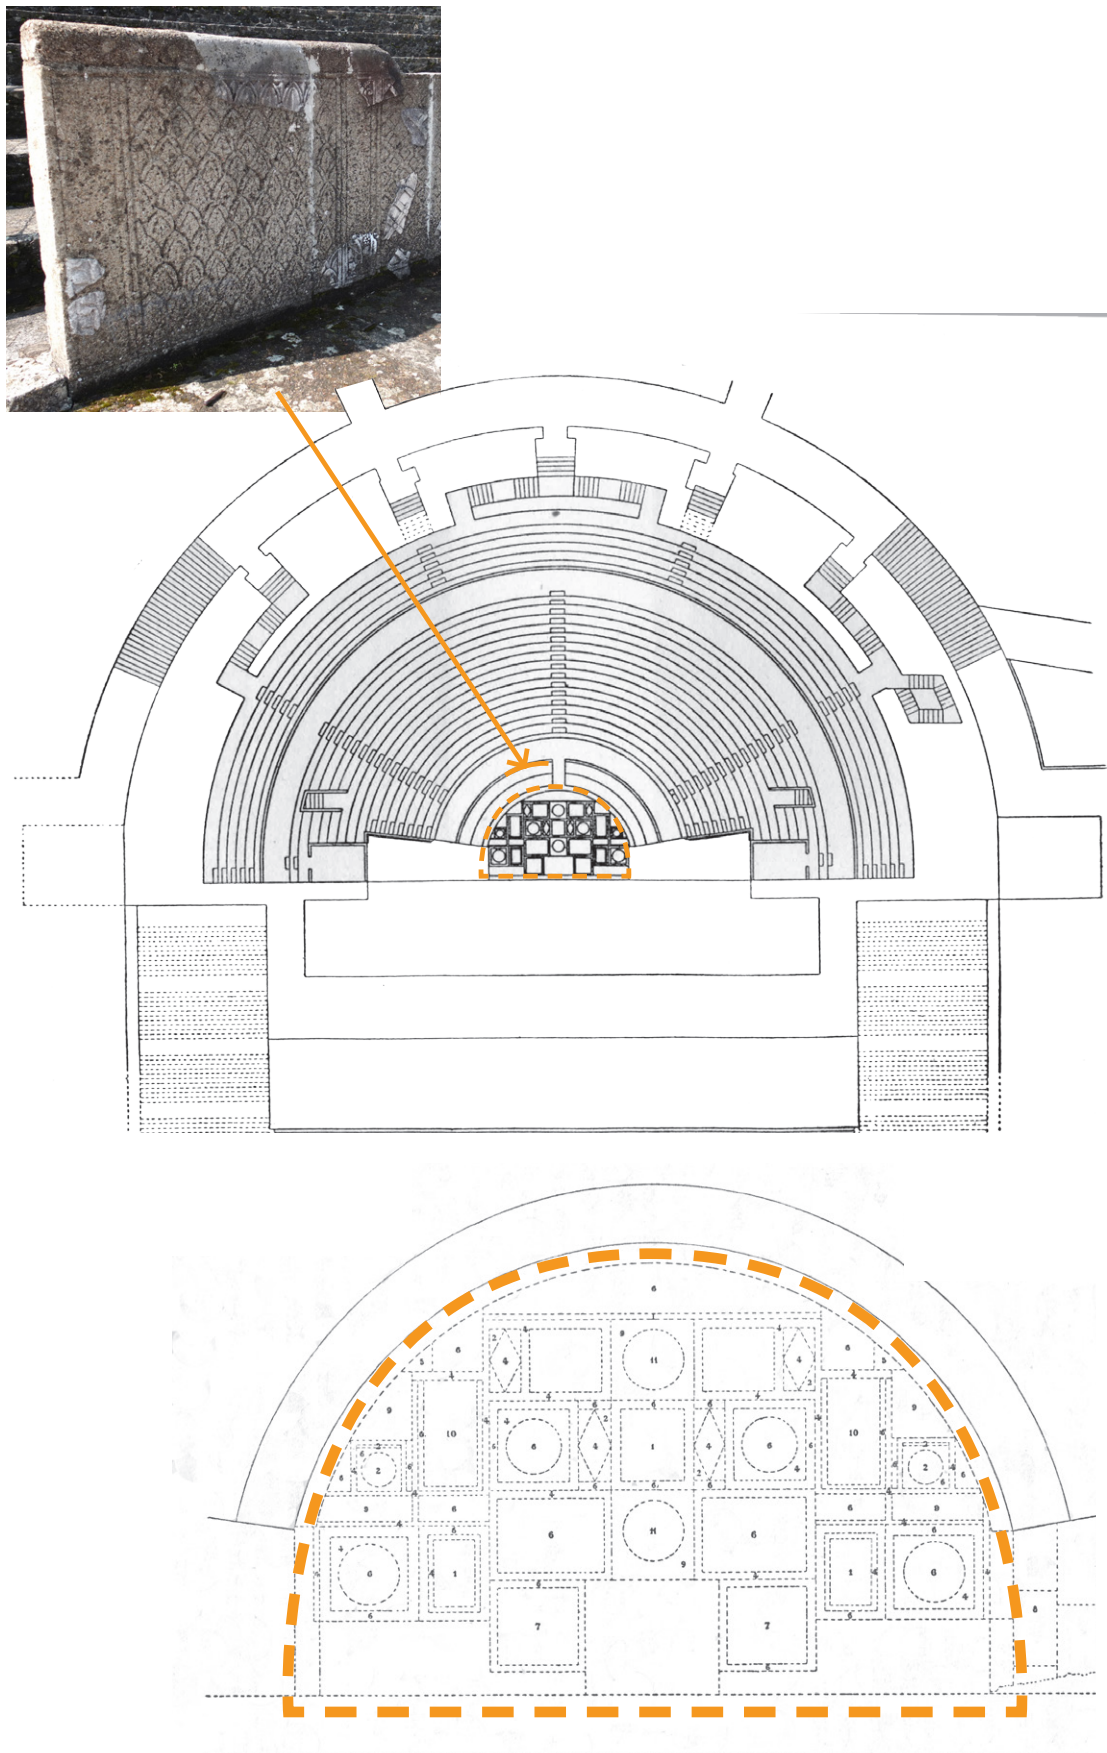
Plan and handrail and paving details of Lyon's odeon
